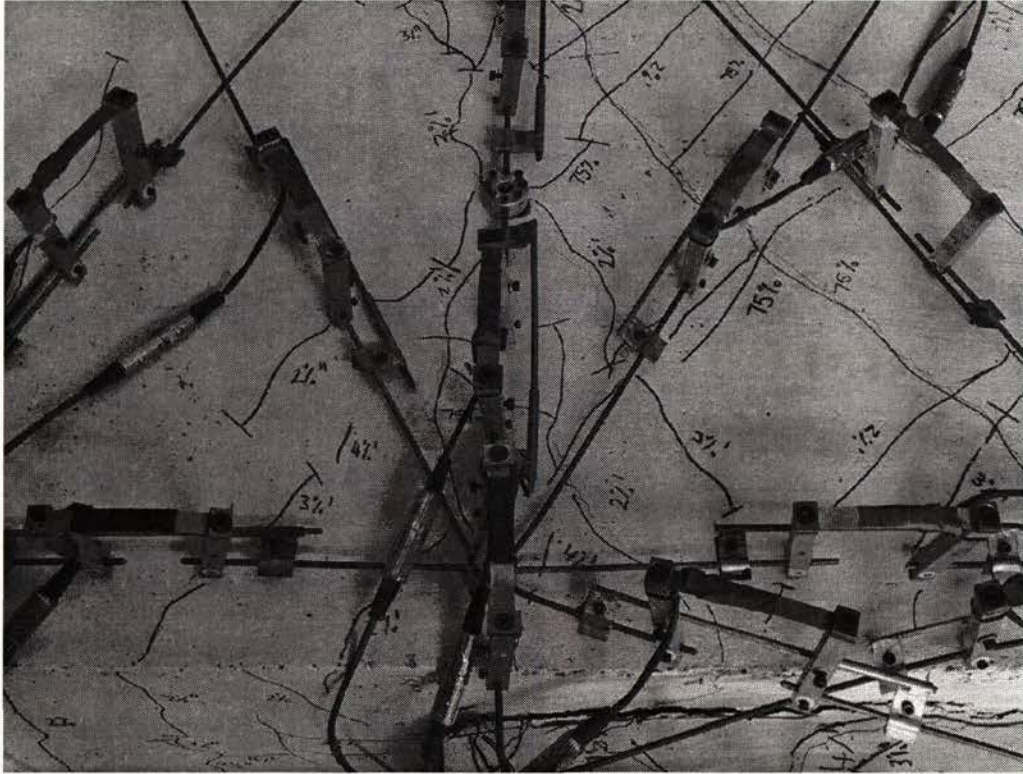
Crack pattern indicating imminent reinforcement slip
